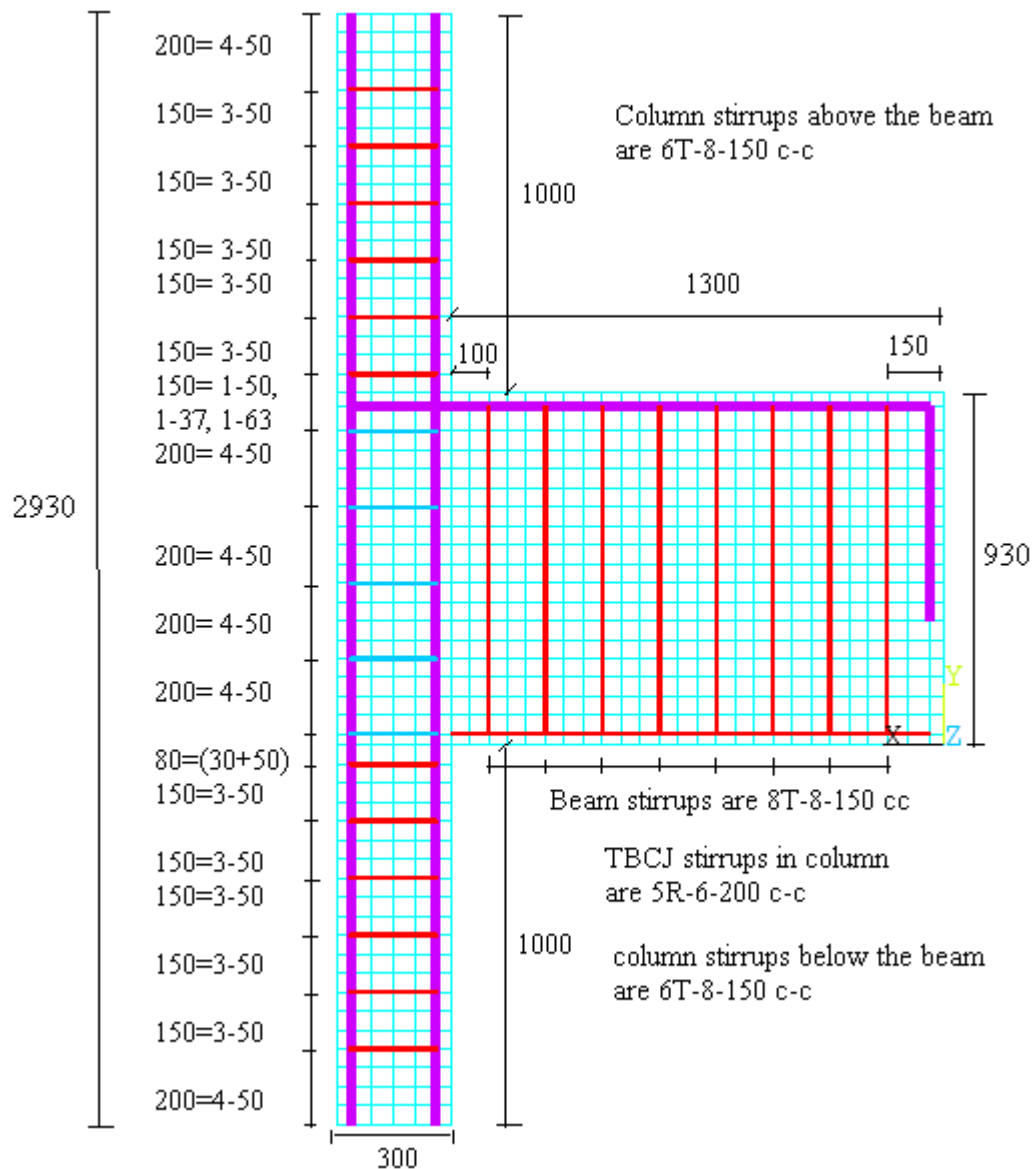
Side elevation of T-NSC1 & HSC1 with column width of 200mm and beam depth of 930mm. Detailing and location of the column and beam stirrups. Column element sizes are shown. (All dimensions are in mm).
